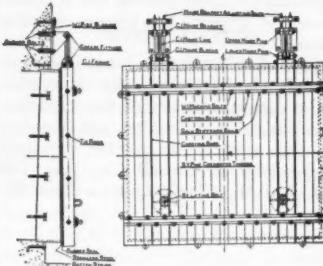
SHOWING TYPICAL CONSTRUCTION
